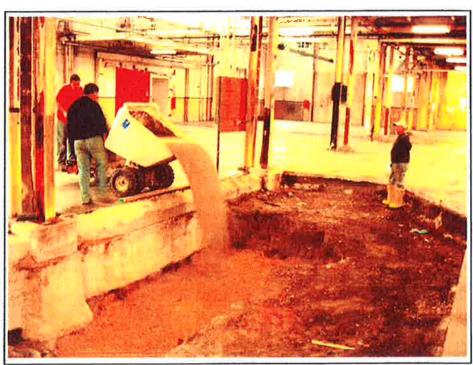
Pouring 1,200 lb/in² compressive strength slurry into the excavation.
